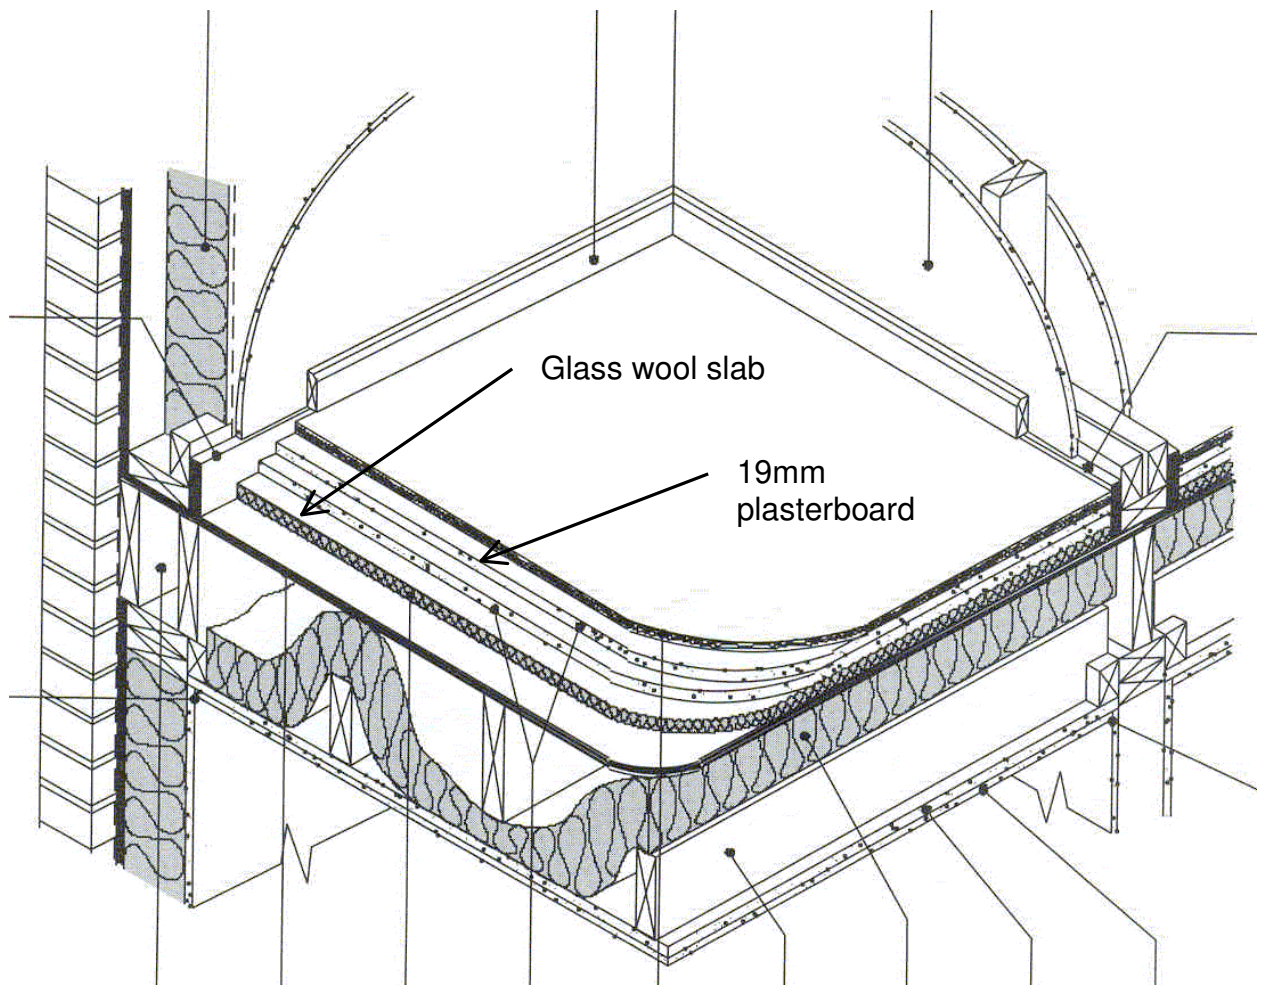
Floor design showing layered sheet material system (floating on glass wool). Also shows independent ceiling joists. (From TRADA Technology report 1/2000).
